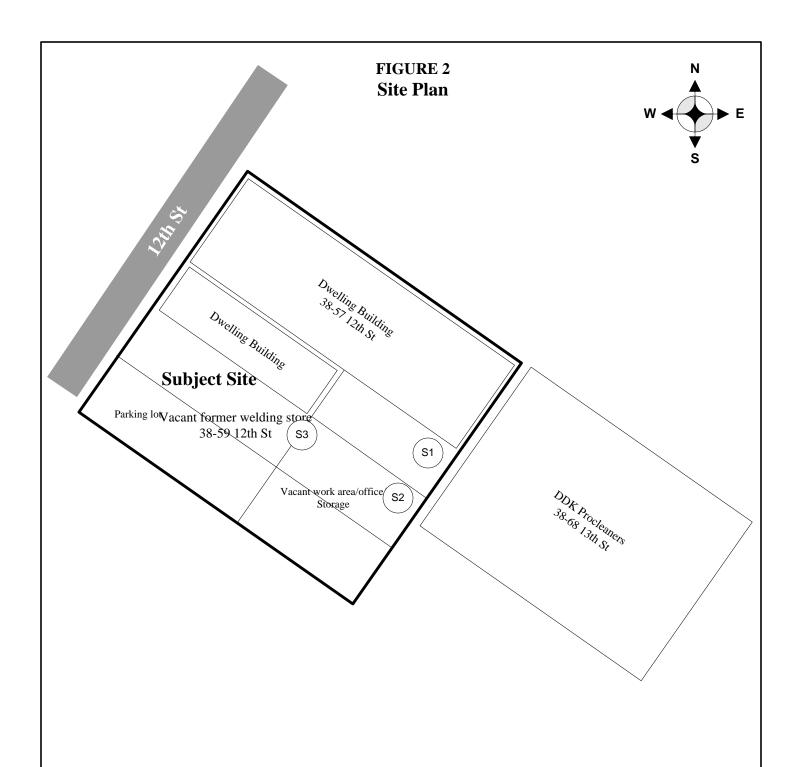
SITE PLOT PLAN SHOWING BORING LOCATIONS
